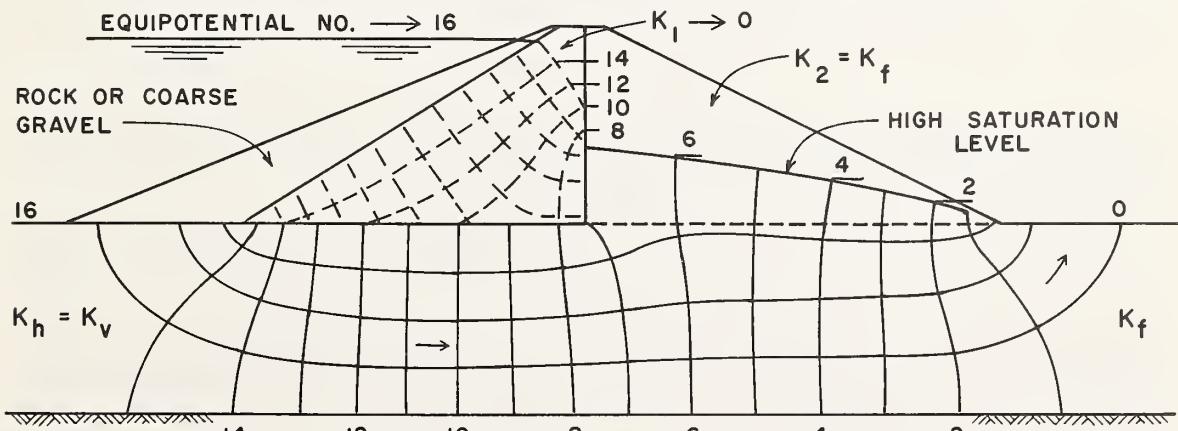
A zoned-earth dam on a pervious foundation. Note high-saturation level in dam.
